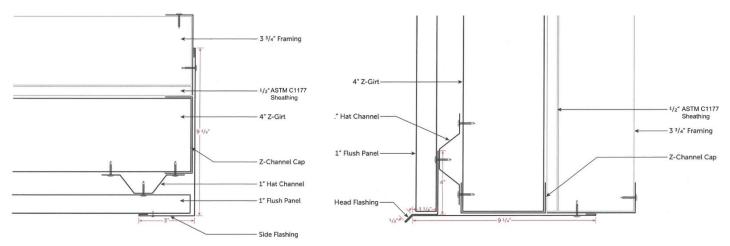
TABLE 3 (OPENING DETAILS)
